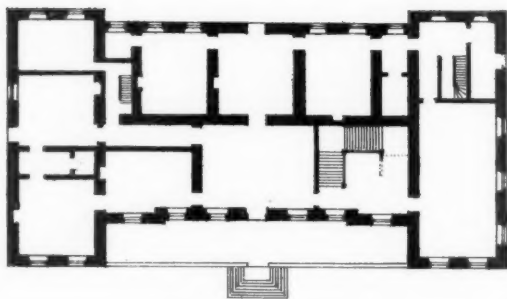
PLAN OF GROUND FLOOR, 1667.
